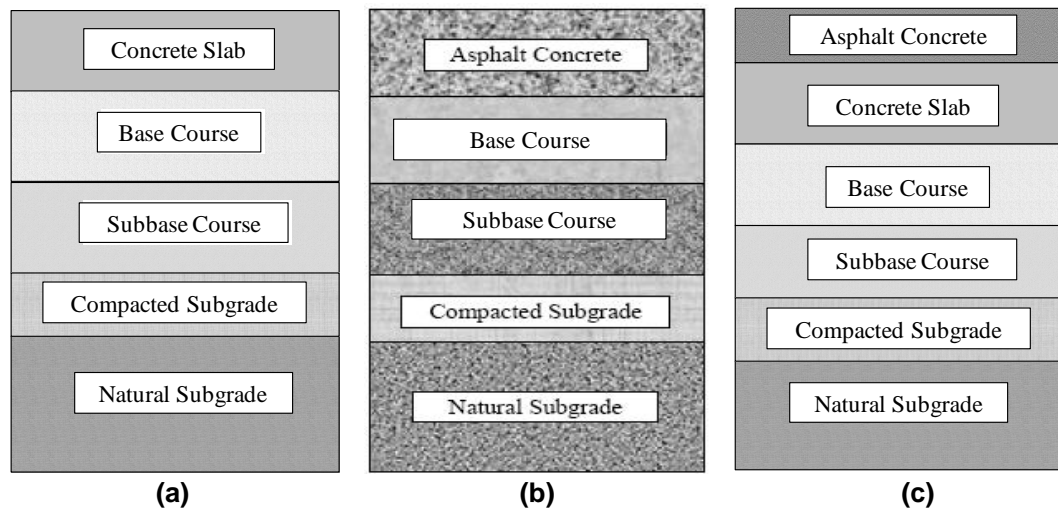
Structure of (a) rigid pavement, (b) flexible pavement, and (c) composite pavement (adopted from *AASHTO 2008*).
